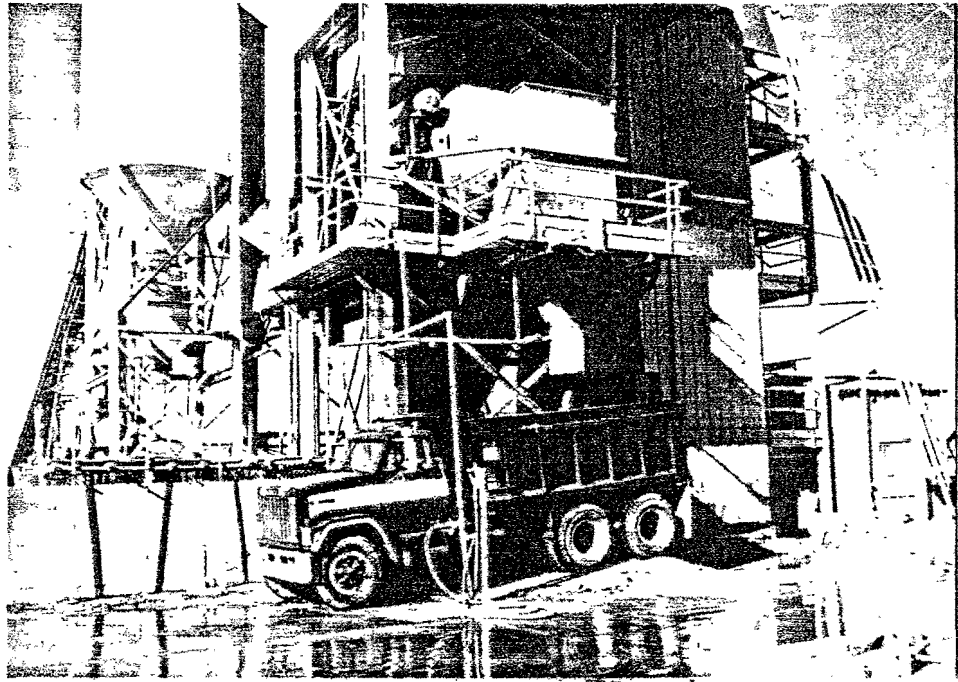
Commercial Ready Mixed Concrete Batch Plant used on Loop 12, Dallas Co. (Test Site 11).
